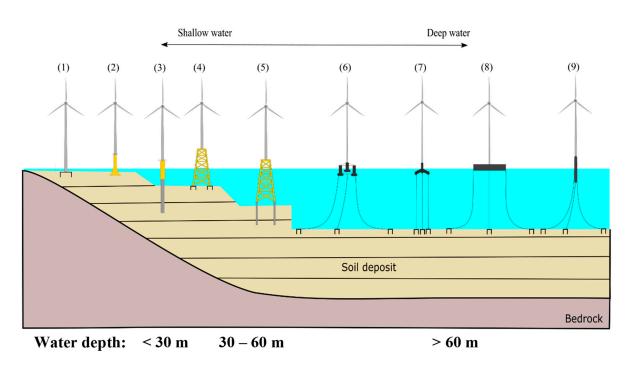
Typical bottom fixed and floating foundations. (1) Suction bucket caisson, (2) gravity-based foundation, (3) monopile, (4) jacket on suction caisson, (5) jacket on monopile, (6) semi-submersible, (7) tension leg platform (TLP), (8) barge, (9) spar.
